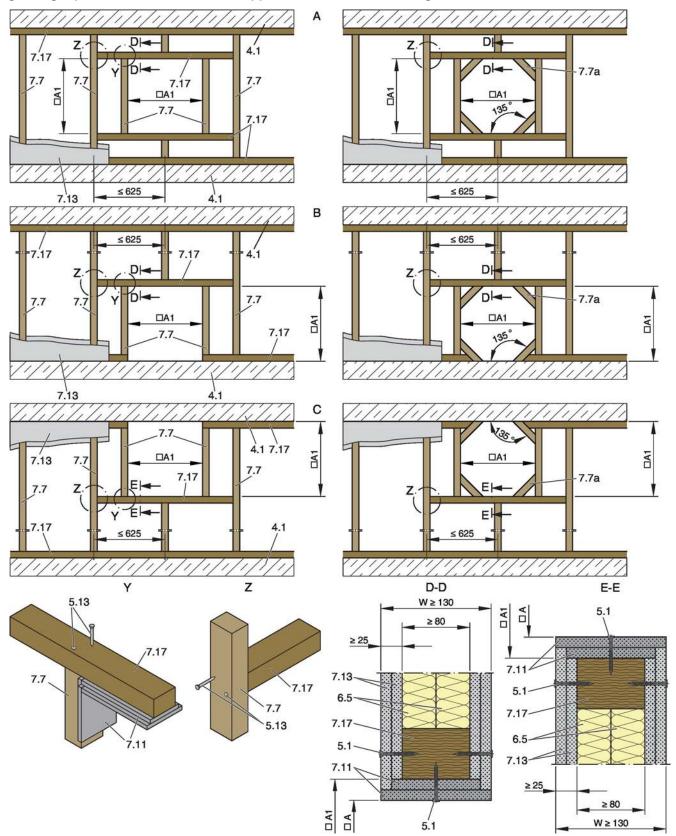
Lightweight partition wall with timber support structure and cladding on both sides, illustration caption Fig. 51
